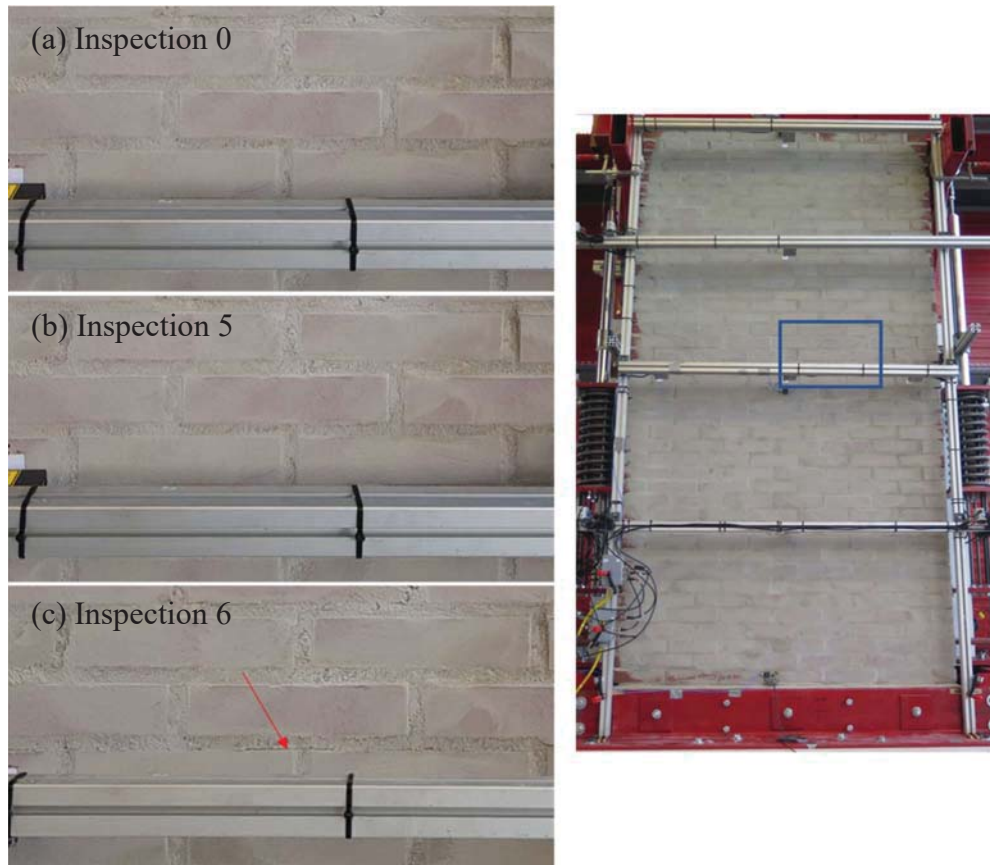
Pictures of the specified zone on specimen R1 (blue frame) in subsequent damage inspections: (a) inspection 0, (b) inspection 5, and (c) inspection 6. The red arrow indicates observed damage (hairline fracture).
